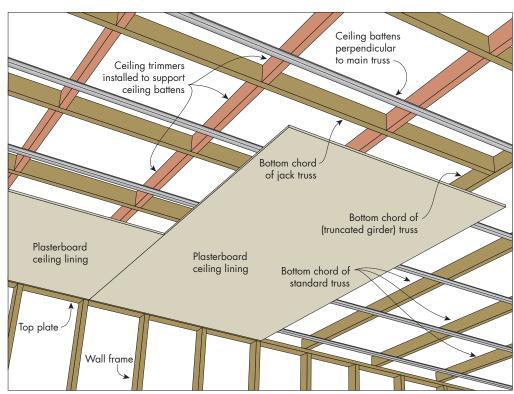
Trimmers to Support Ceiling Battens at Change of Truss Direction Perspective
